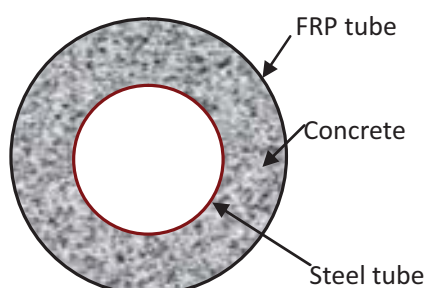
Cross section of hybrid FRP-concrete-steel double-skin tubular column
